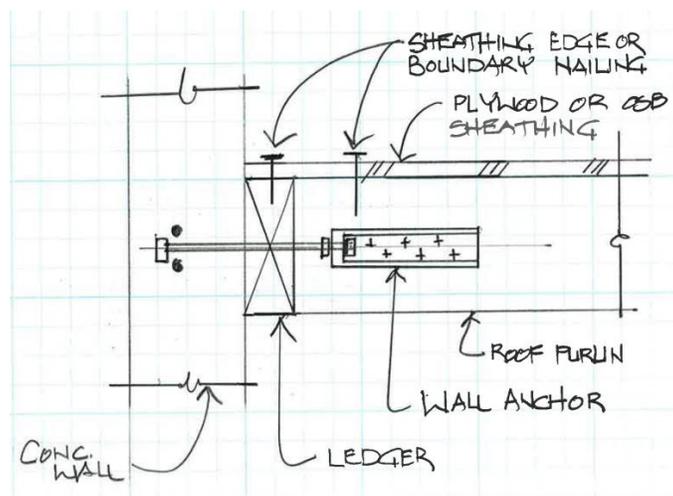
Concrete wall anchor to wood-frame diaphragm or subdiaphragm
